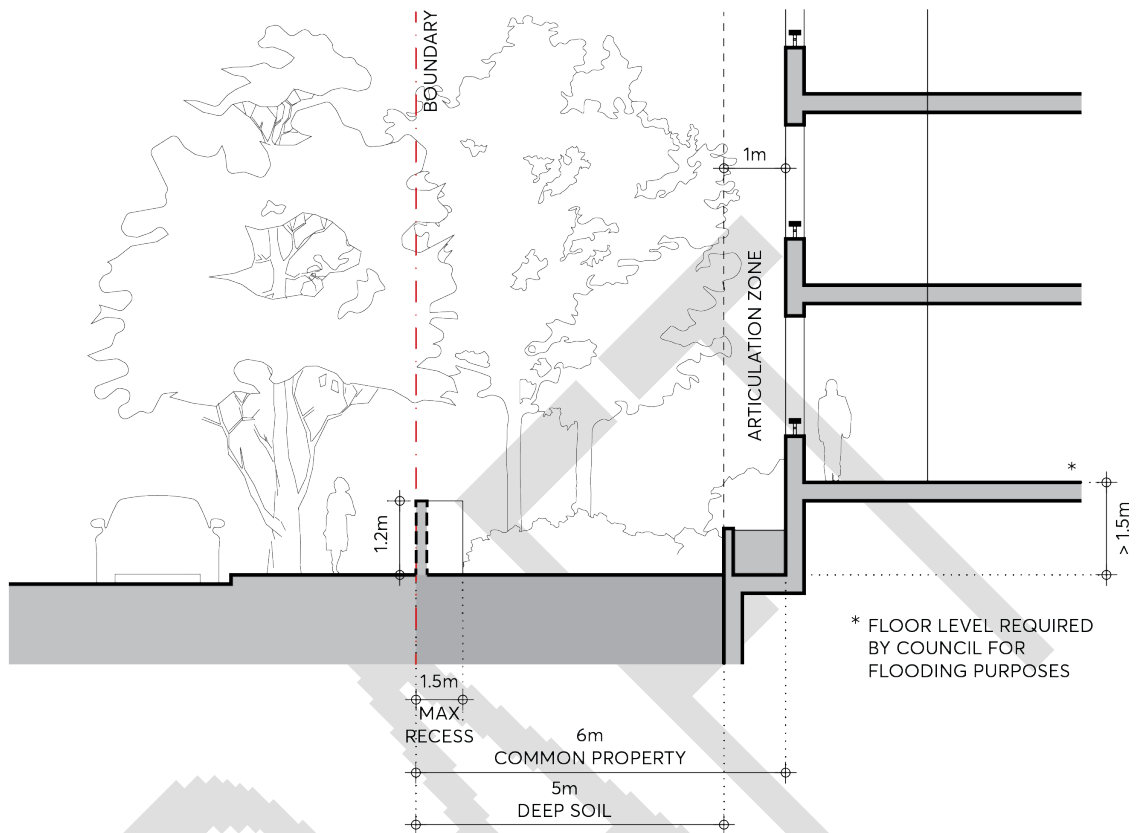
Residential Ground Floor: Floor level required greater than 1.5m above footpath level
